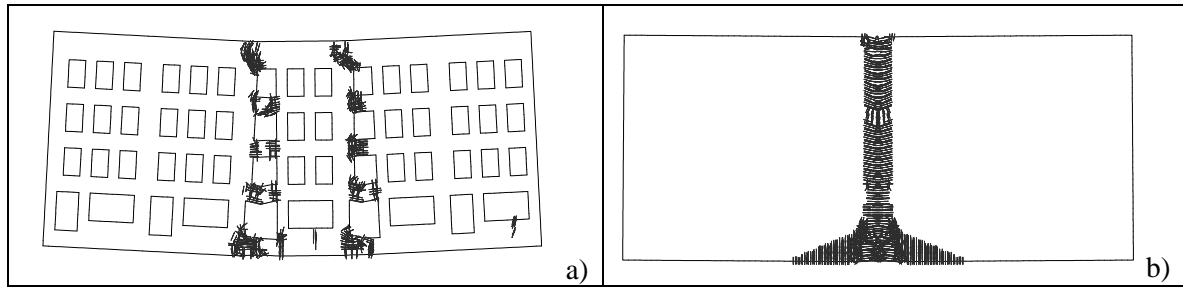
Crack pattern, comparison between: sagging zone, smooth interface, façade with windows (a), wall without openings (b).
